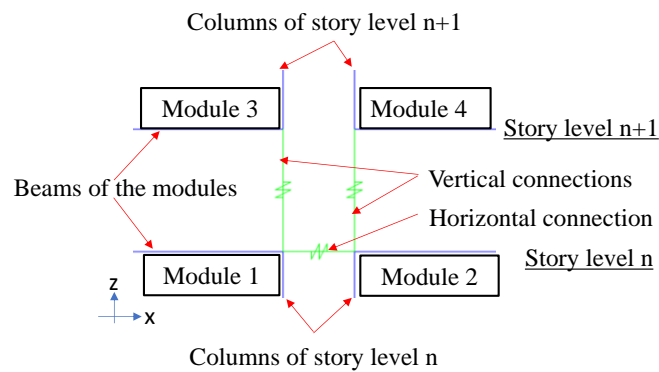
Modeling of an inter-modular connection between four adjacent modules
